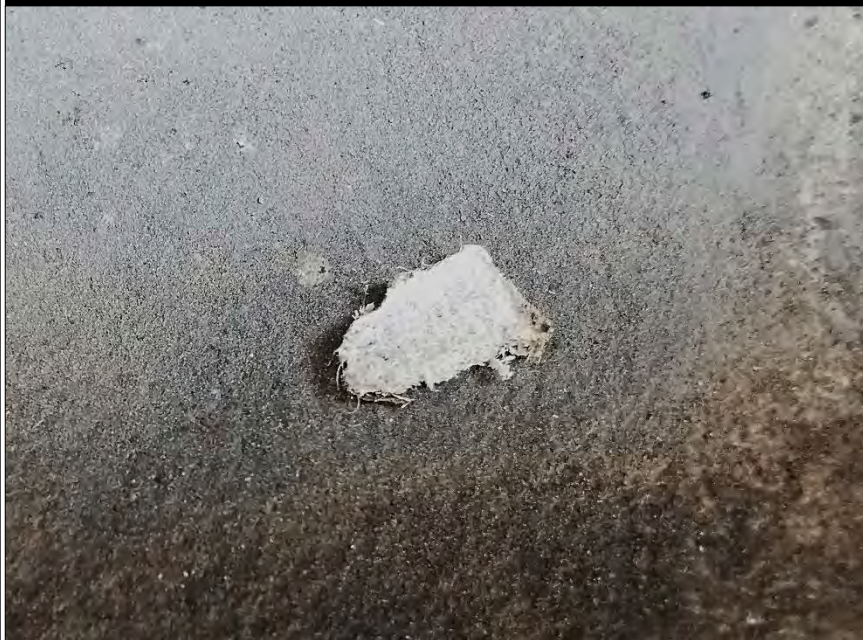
RESIDENCE WITH CHIPPED, POTENTIAL ACM BOARDING, NEXT TO A SHED (LOCATION 8) FACING WEST
